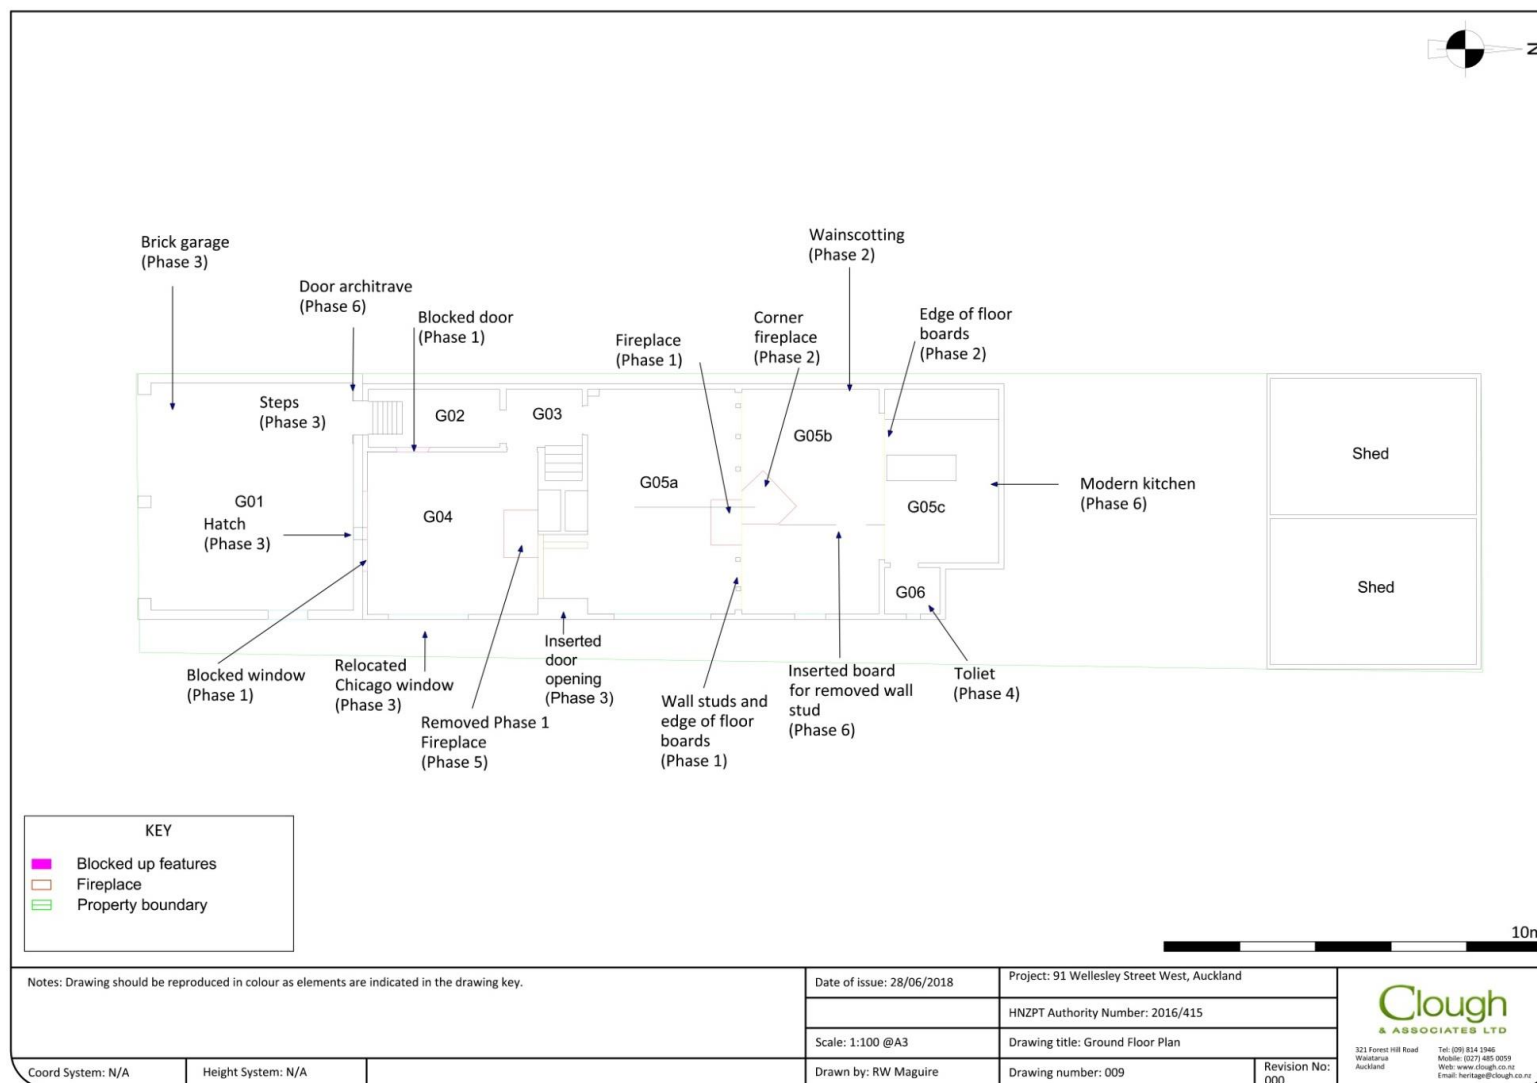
Ground floor plan of 91 Wellesley Street West (source: Clough & Associates, 2015)
